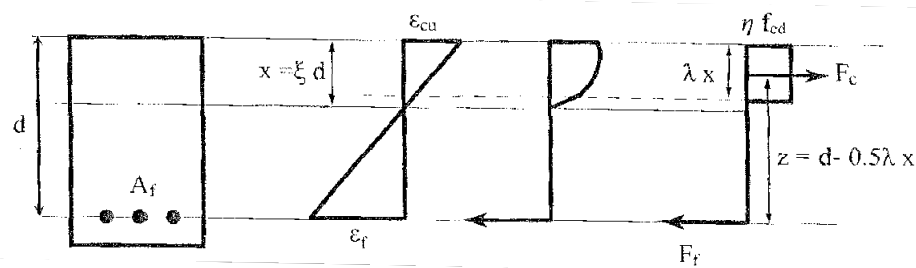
Simplified stress block proposed for FRP reinforced concrete members (fib 40, 2007).
